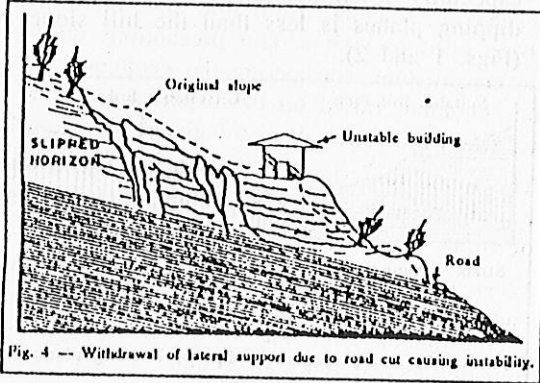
Withdrawal of lateral support due to road cut causing instability.
